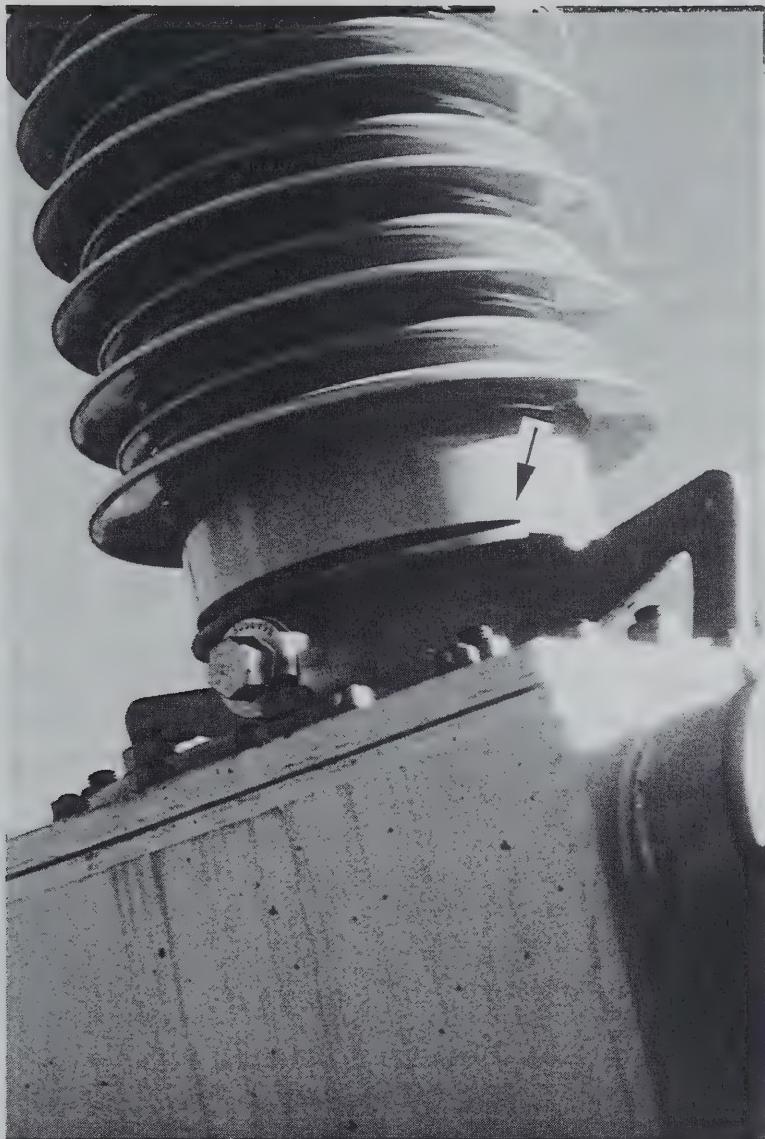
The metal flange supporting this transformer has cracked.
